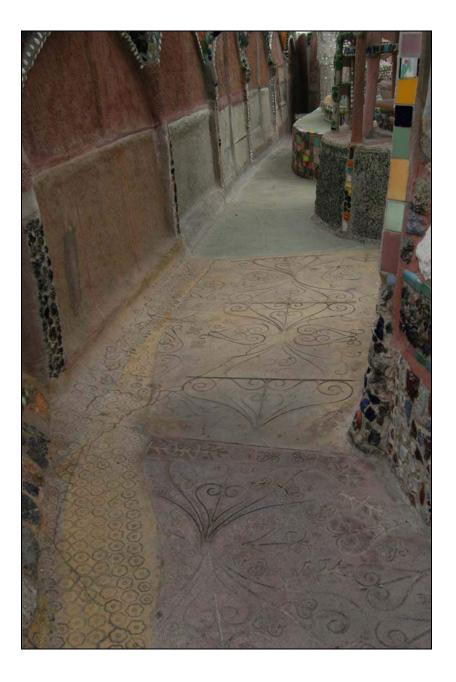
Ornamental floor on the north side of the towers showing red-, yellow-, and greencolored concrete slab with stamped patterns.
